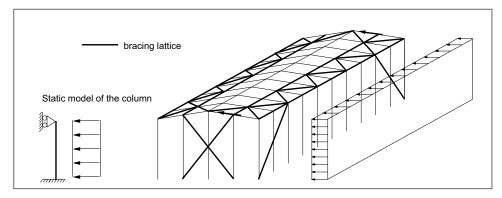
Horizontal bracing of the Example building (all columns are not shown)
